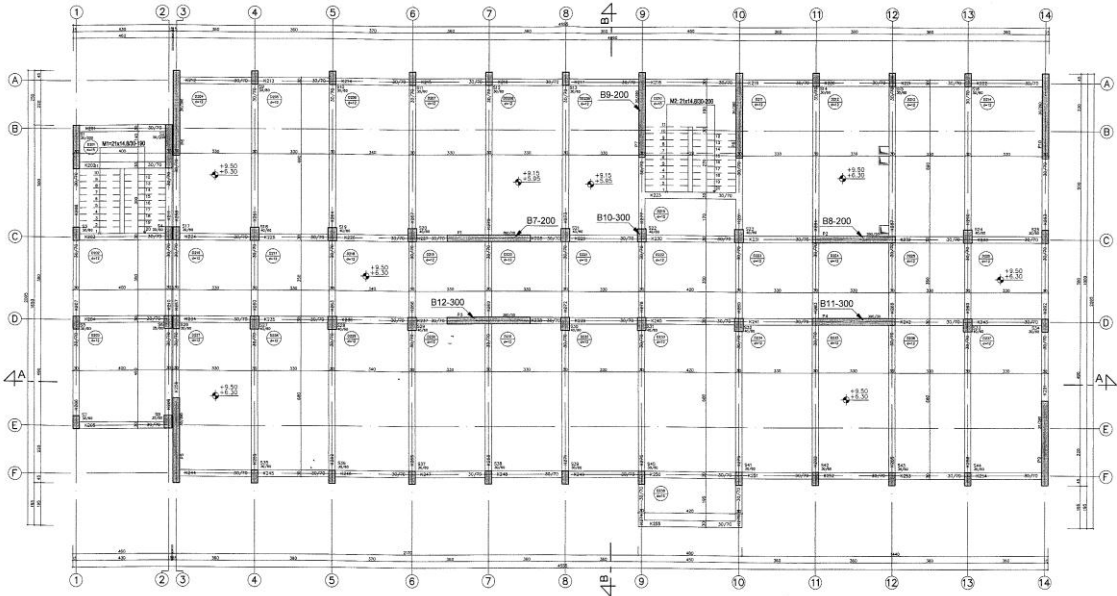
Typical Plan of Example Building Showing Frame and Wall Layout
